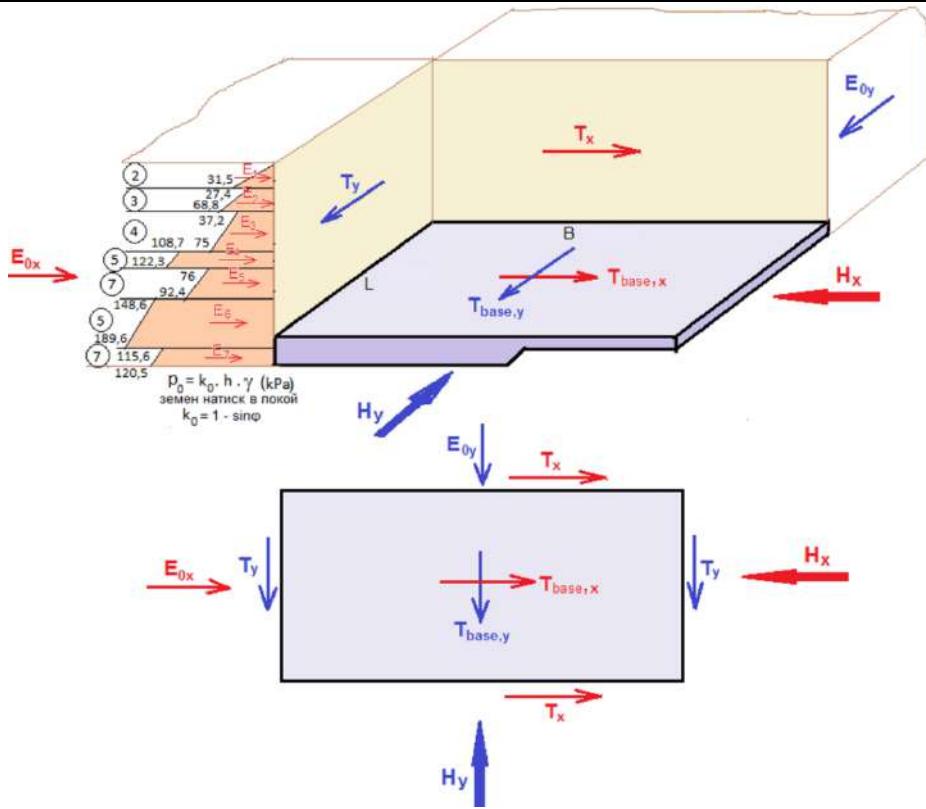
Resistance forces of the foundation structure against horizontal loading
